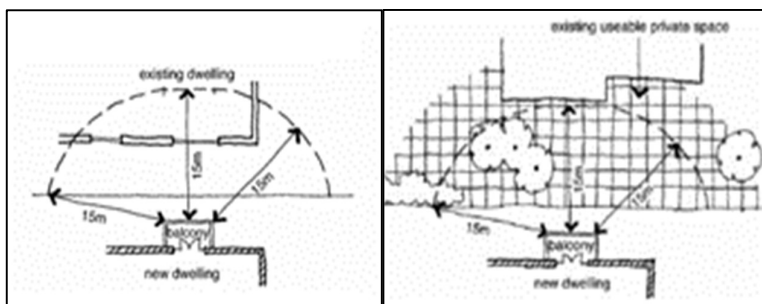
Extract from Planning and Design Code illustrating direct overlooking from deck, balcony, or terrace
